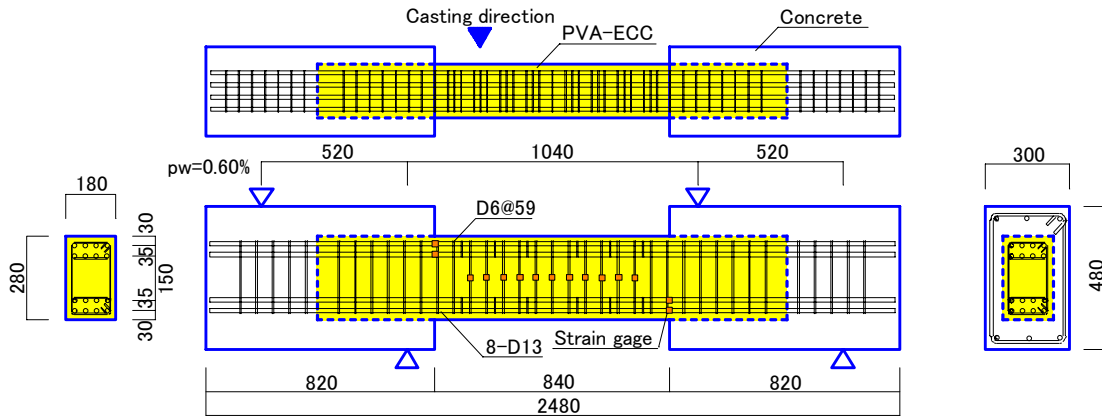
Example of beam specimen arrangement (PVA20-60L)
